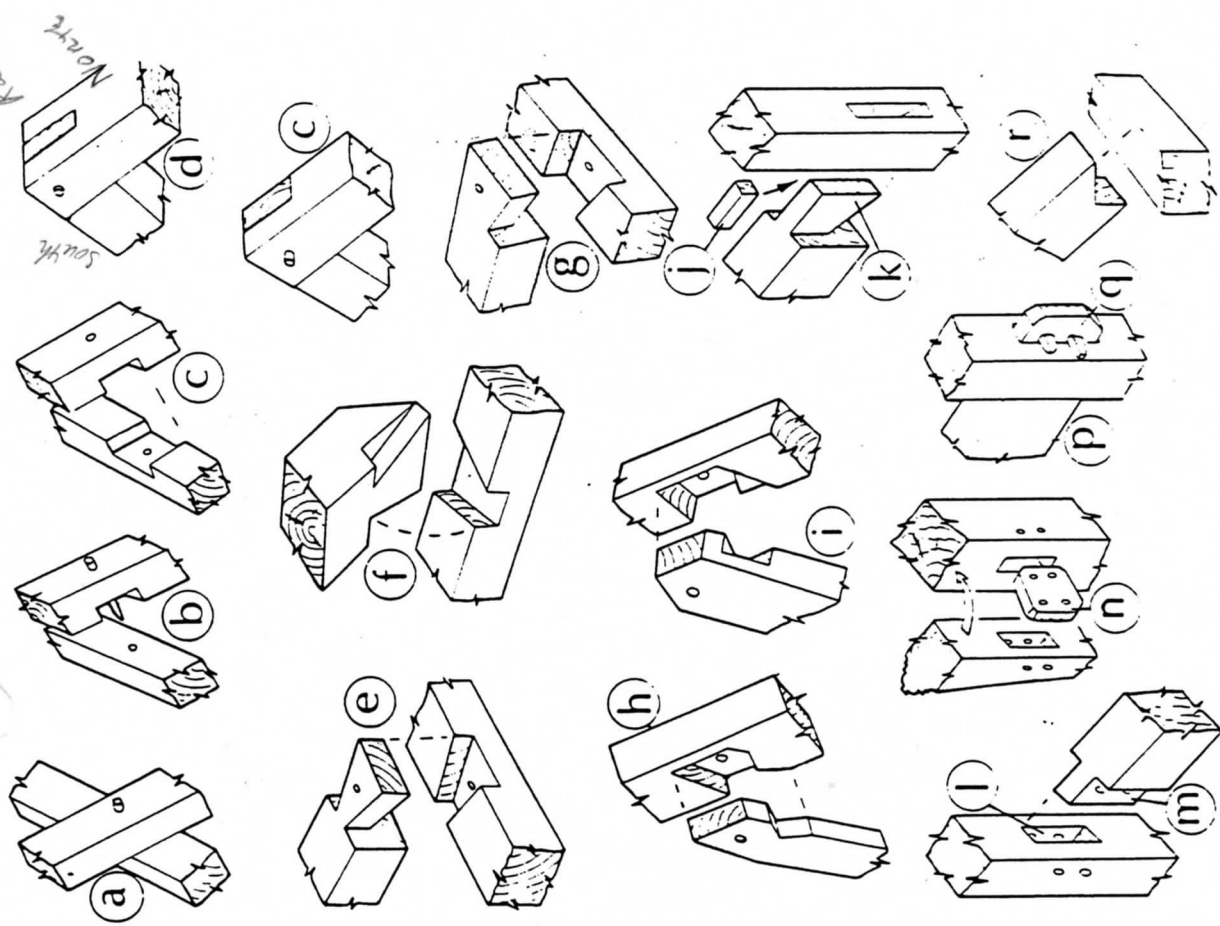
Lap and mortice joints a) Lap joint b) Half-lap joint c*) Half-lap joint d) Bridled joint e) Dovetail f) Lap dovetail g) Bare-faced dovetail h) Notched-lap joint i) Secret notched-lap joint j) Key k) Bare-faced dovetail tenon l) Mortice m) Tenon n) Slip tenon p) Anchor beam q) Through tenon r) Birdmouthed joint
